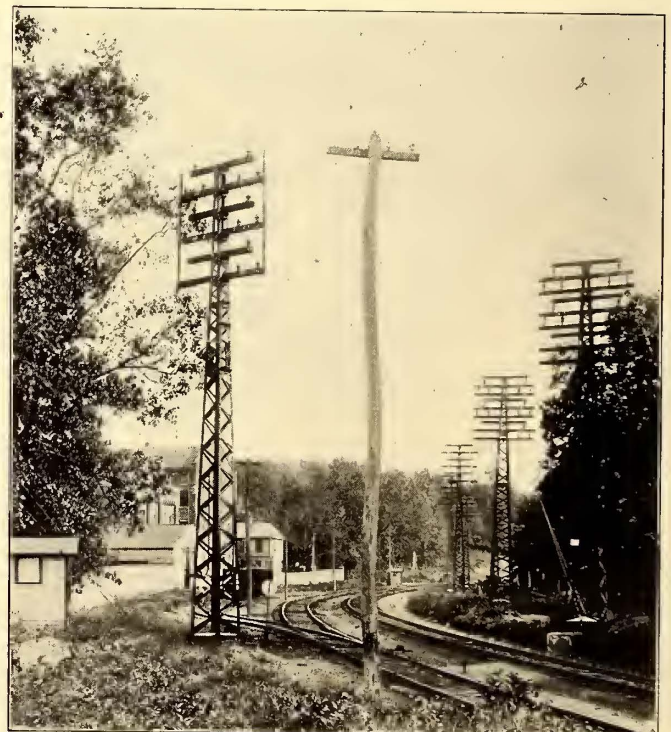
CABLE RETAINERS IN POSITION, TRUNK-LINE POLES OVER RAILROAD TRACKS
